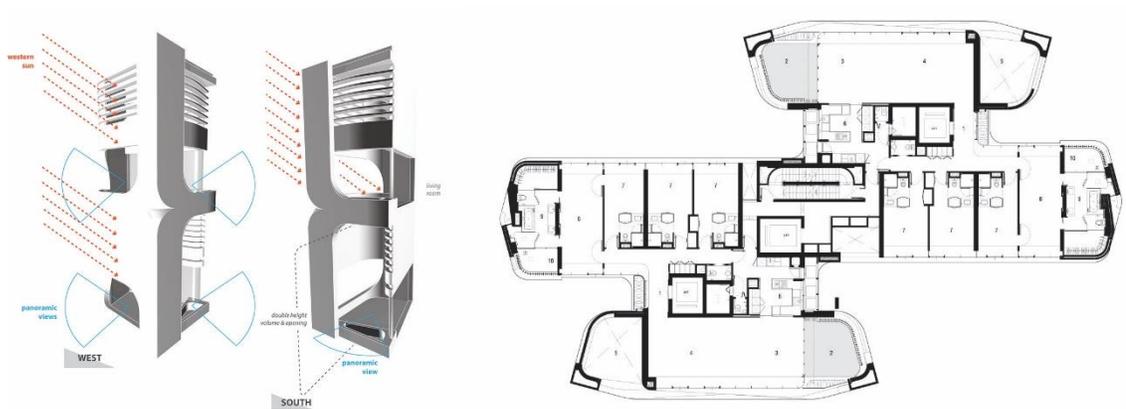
Western and southern façade (left), Plan (right) [UN studio, 2013]
